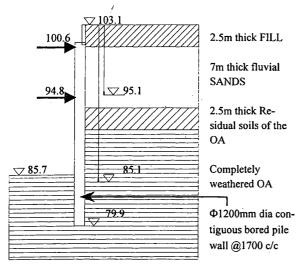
Soil conditions and piezometers at TBM launch shaft at Farrer Park station
